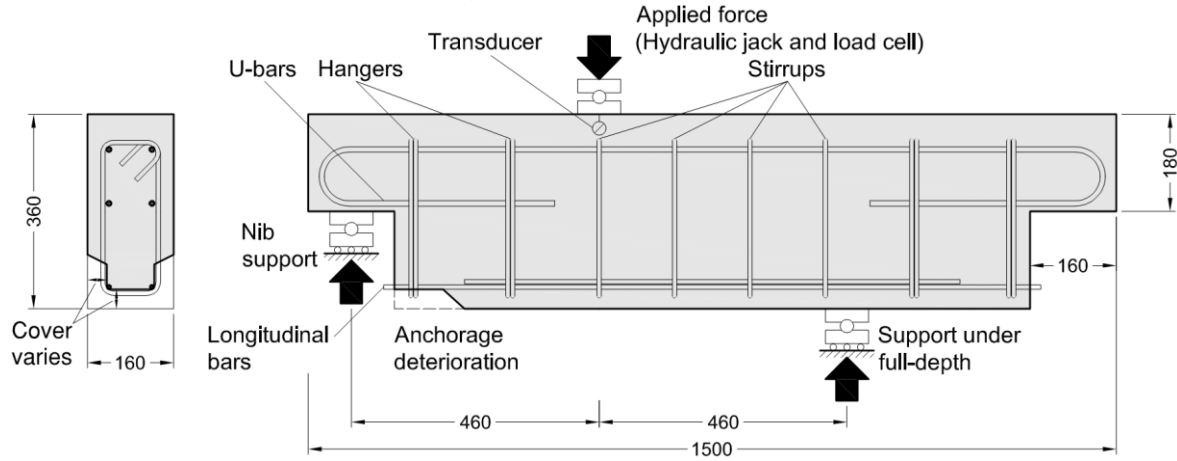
Set-up and reinforcement layout of 3-point bending test. Left half-joint under testing while the right half-joint is unstressed
